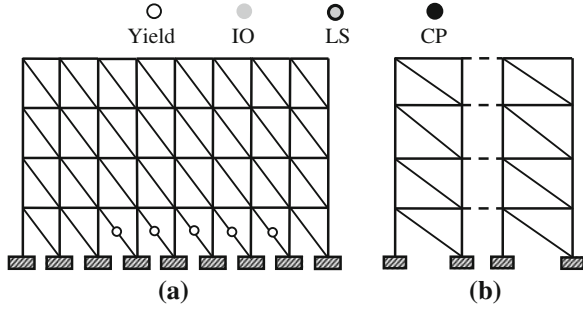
Hinge pattern under gravity load, for the ten storey uniformly infilled frame building, designed for gravity loads only, when construction sequence is not considered in analysis: a typical longitudinal frame; b typical transverse frame
